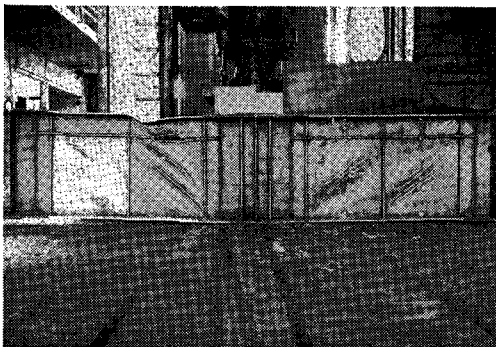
Collapse Mode of Test Girder (S-35-1)
